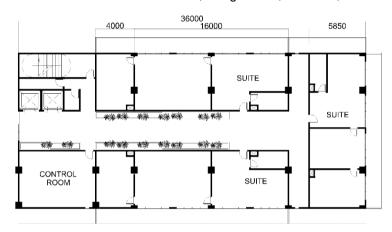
7th – 10th Floor Plan Source: (Author, 2022)
